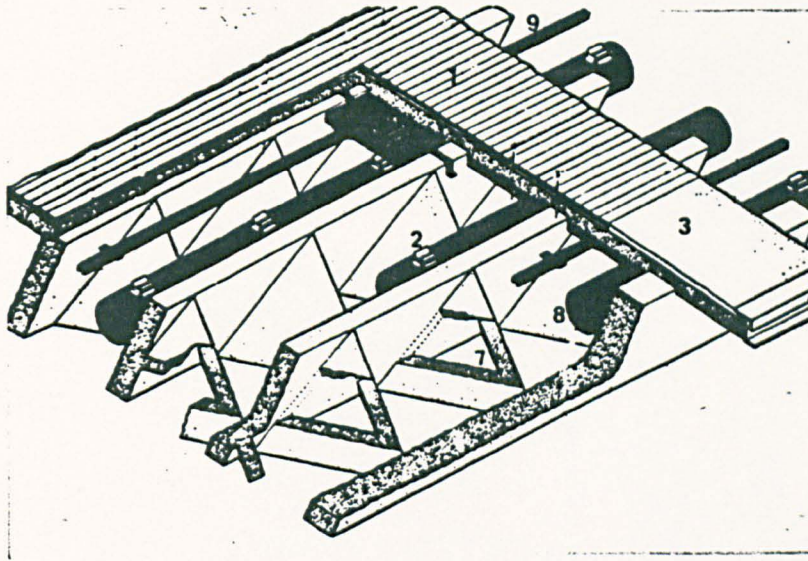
Louis I. Kahn, Yale Art Gallery, New Haven, 1951-53, Air distribution system showing: 1. oak flooring; 2. air outlet; 3. terrazzo; 4. floor slab; 5. framing at window; 6. acoustical plank; 7. bridging, 8. continuous air distribution duct; 9. electrical raceway for adjustable lighting units.
